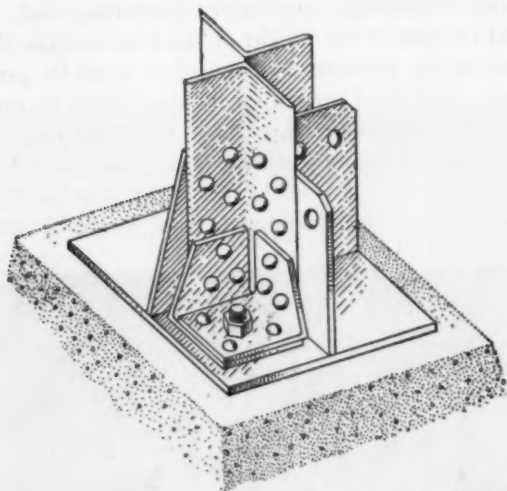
TYPICAL CONSTRUCTION OF FOOTING FOR ANGLE IRON COLUMN
